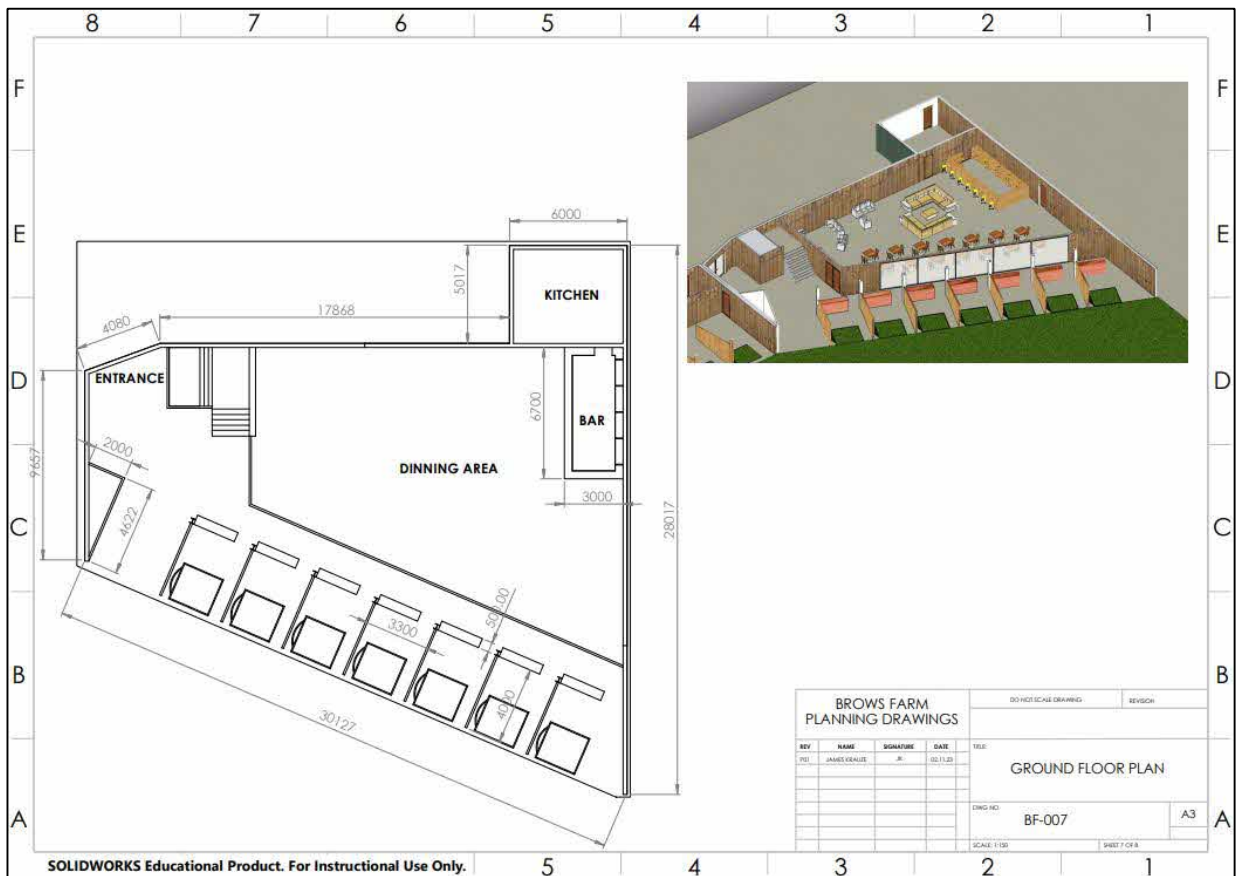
PROPOSED GROUND FLOOR PLAN
